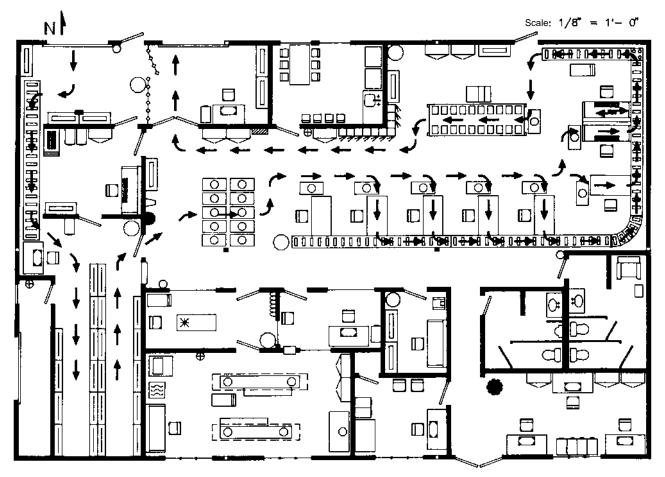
A two-dimensional computer-generated detailed layout of one area of an industrial plant, showing furniture, fixtures, and flow path. (Source: Cederleaf, "Plant Layout and Flow Improvement," McGraw-Hill.)
